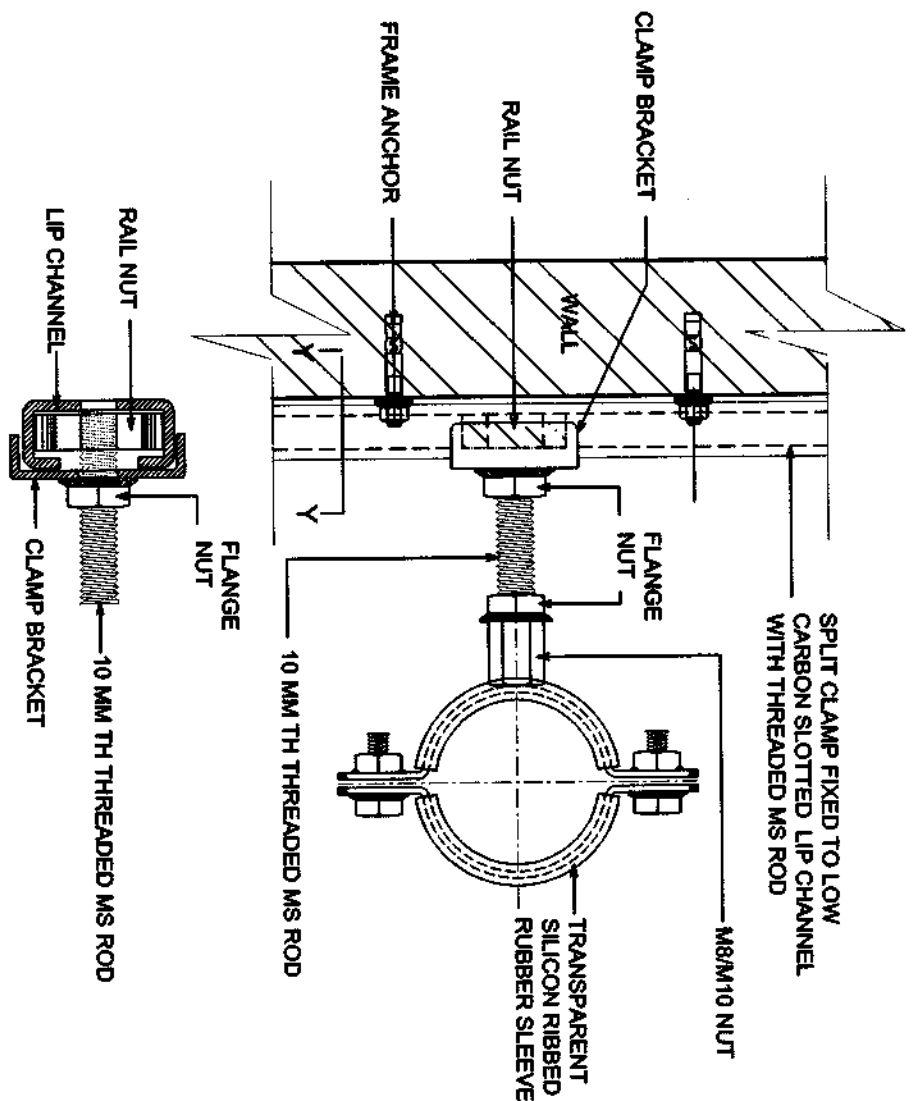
DETAILS OF BRACKET & OTHER MISC DETAILS FOR VERTICAL PIPE SUPPORTING SYSTEM
